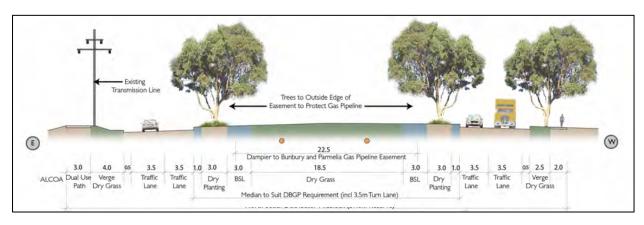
Proposed Road Reservation Width and Cross-Section for the NSDDR - South of Hope Valley Road
